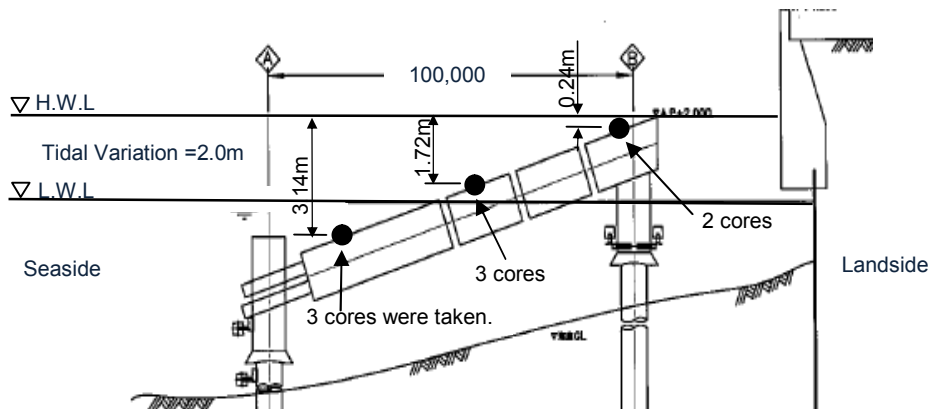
Structural Drawing of Breakwater (BFC concrete)
